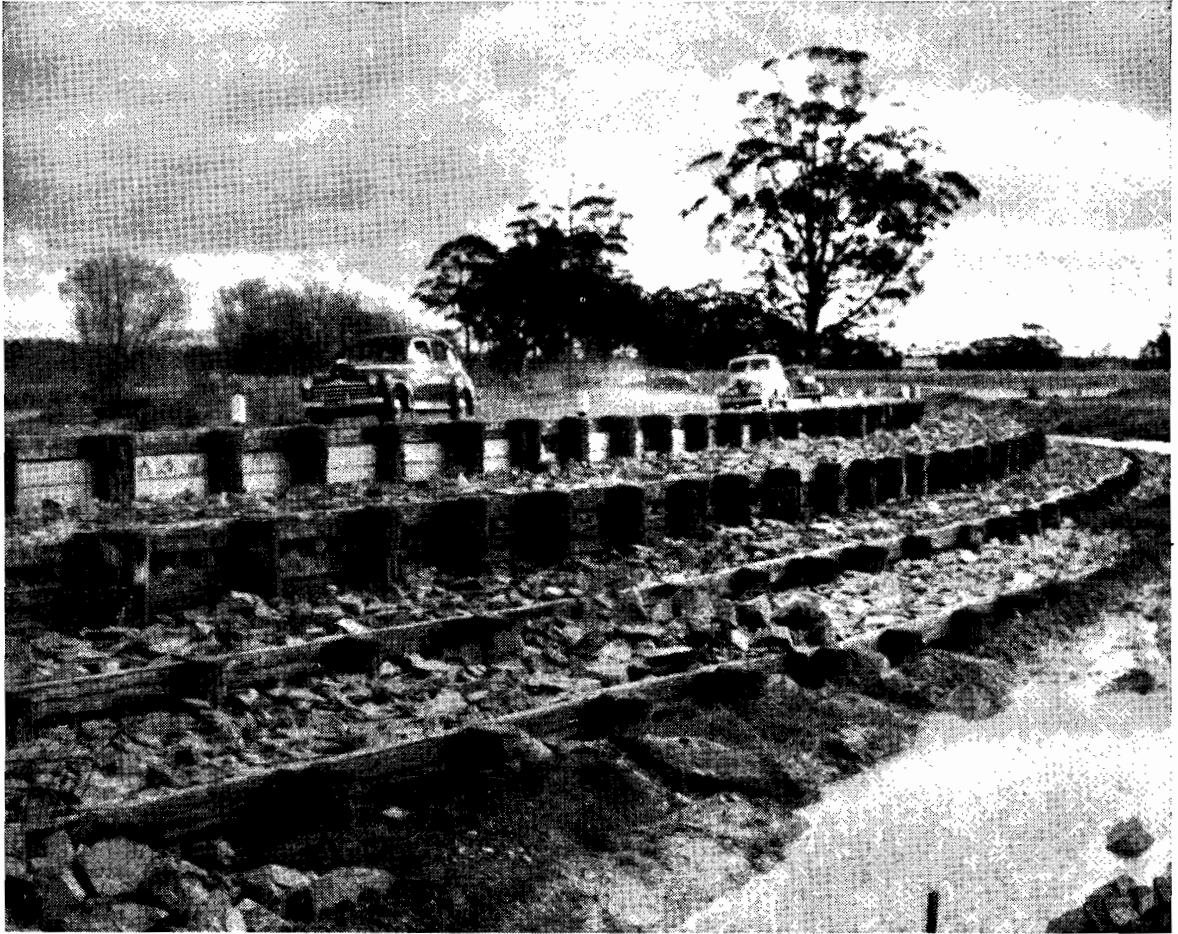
Completed work at Gilbert's Gulch, Marlo Road, Orbost Shire.
